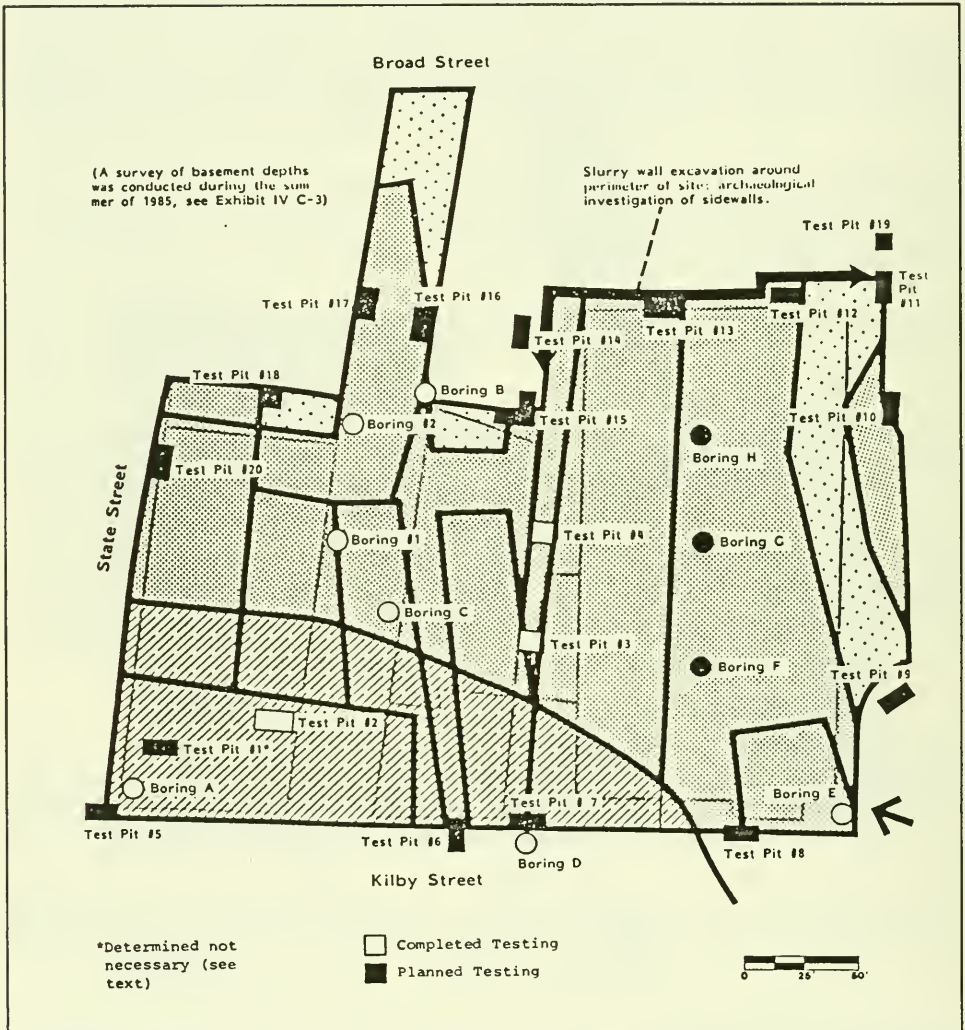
Boring, Hand Test, and Backhoe Test Unit Locations
